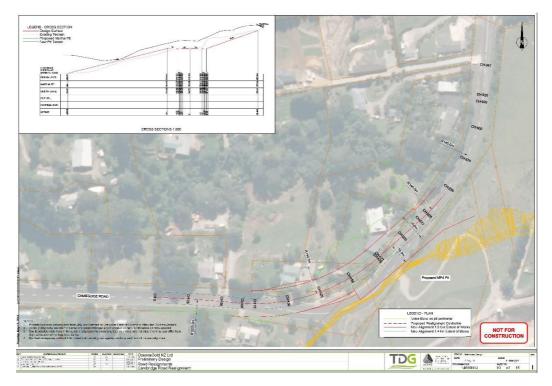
Concept Plan for the Re-Alignment of Bulltown / Cambridge Roads
